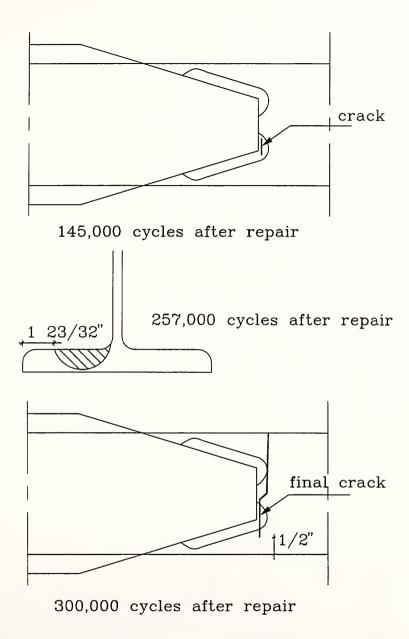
Crack Location - Specimen WR4. (North End)
